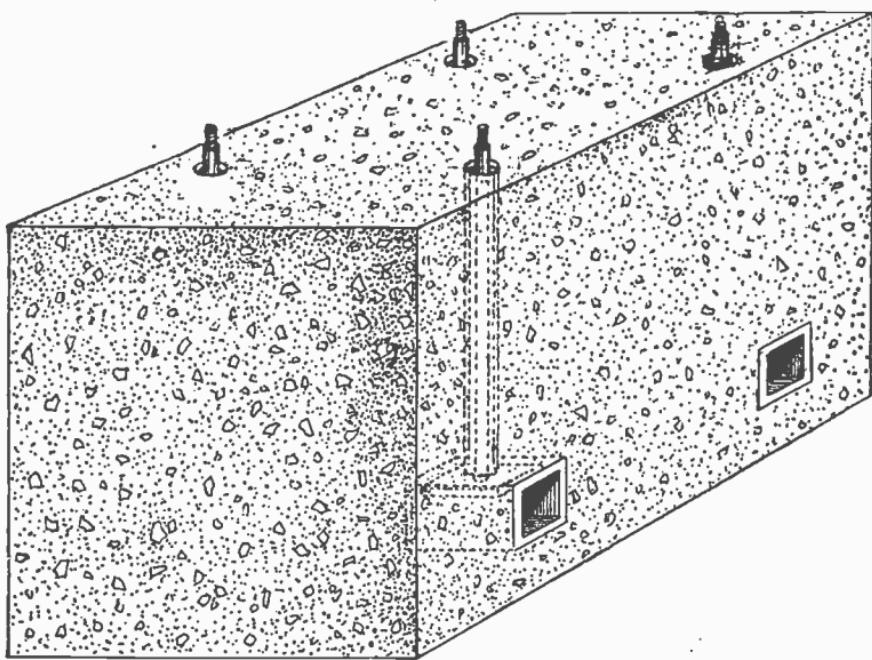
,937.—Concrete foundation, showing method of installing the anchor bolts.
